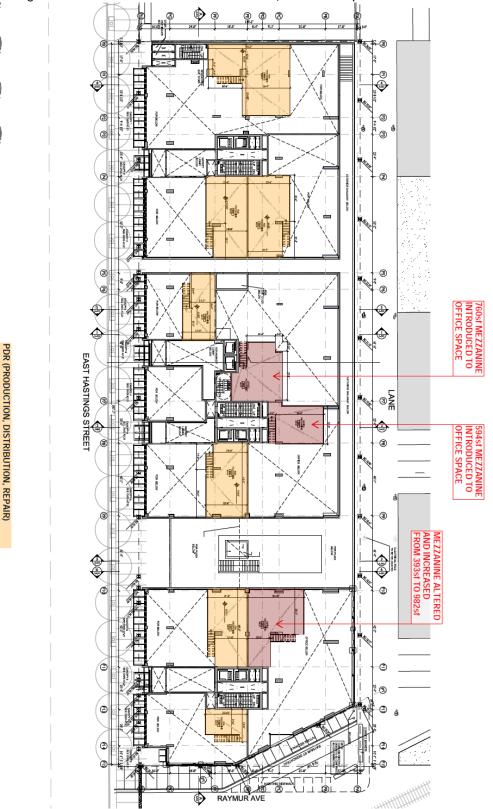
Ground Floor Mezzanine Plan (includes expanded office mezzanine)
